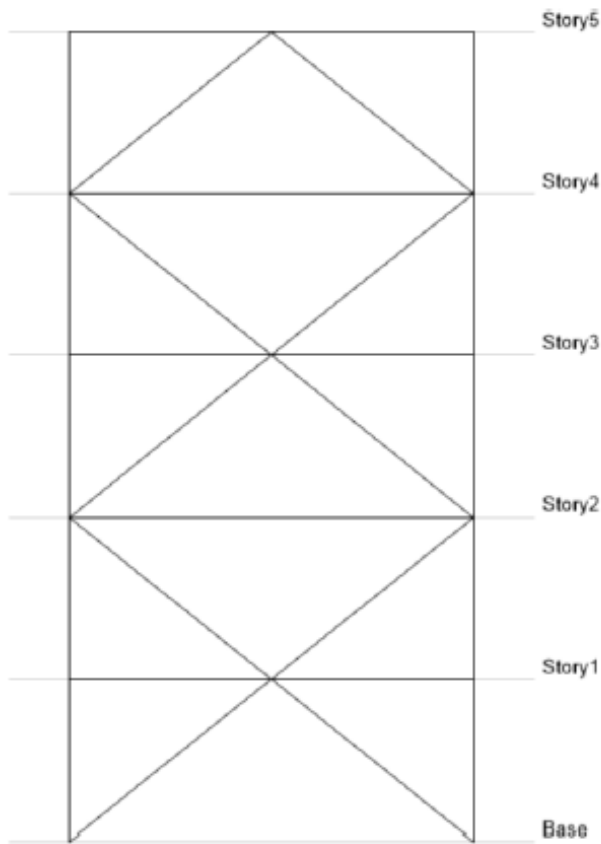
Elevation view of Silo supporting steel structure (TYPE-B brace arrangement)
